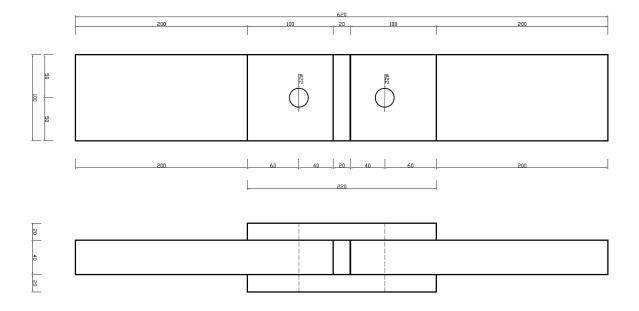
Plate dimensions for long bolt test I/d ratio 4
